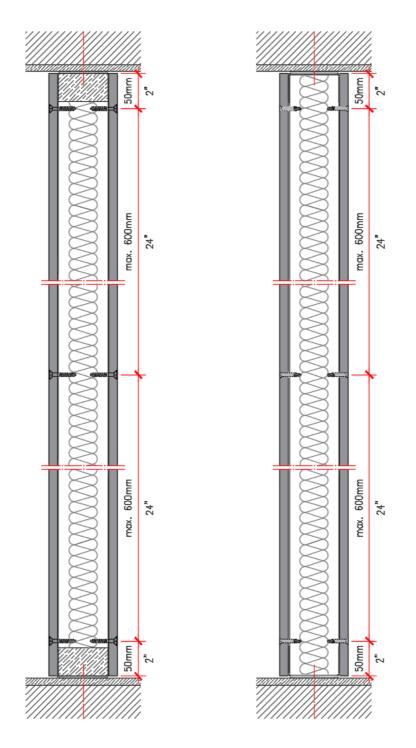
Vertical section of the wall Structure, wood and galvanized steel
